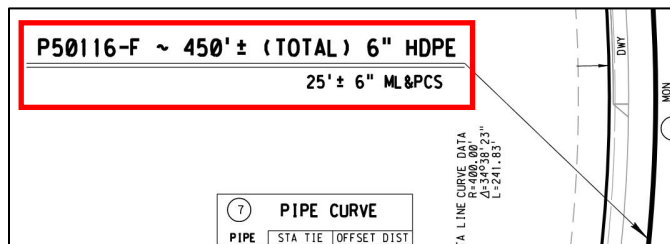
Example Pipe Callout with additional Pipe Material below
